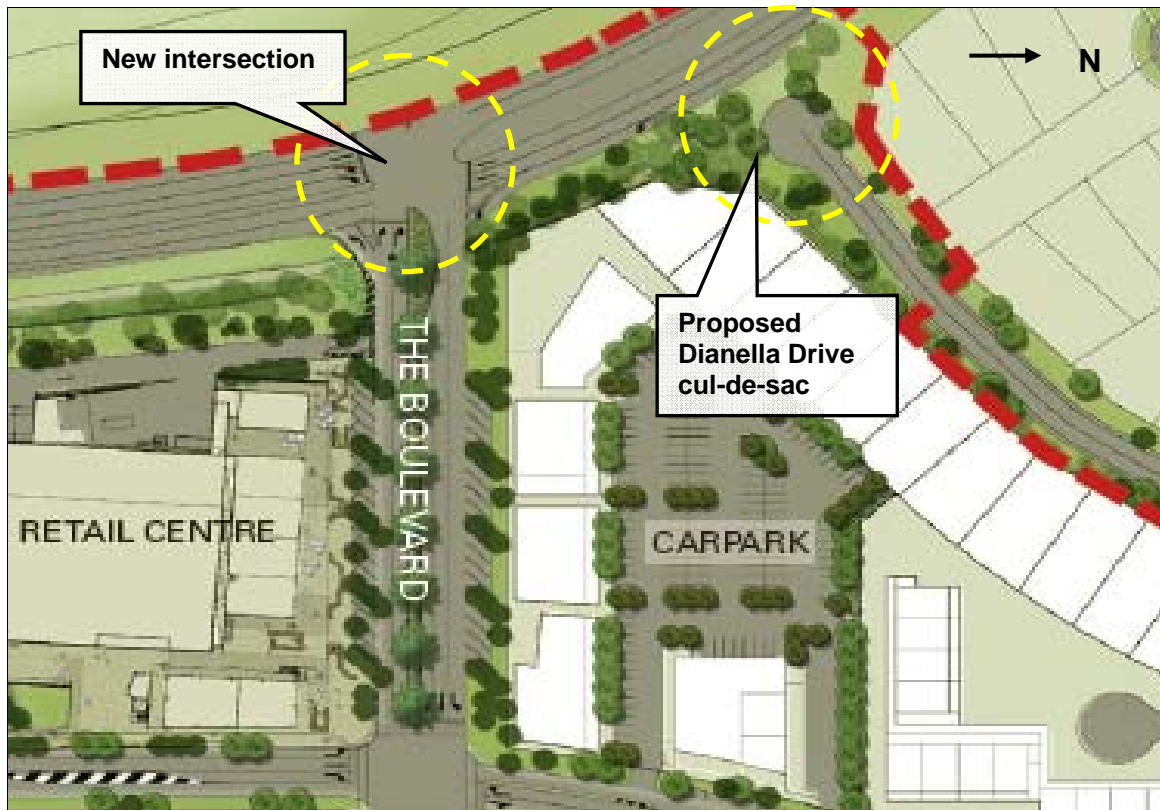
Closure of Dianella Drive and new intersection of The Boulevard and Tweed Coast Road (source: Preferred Project Report)
